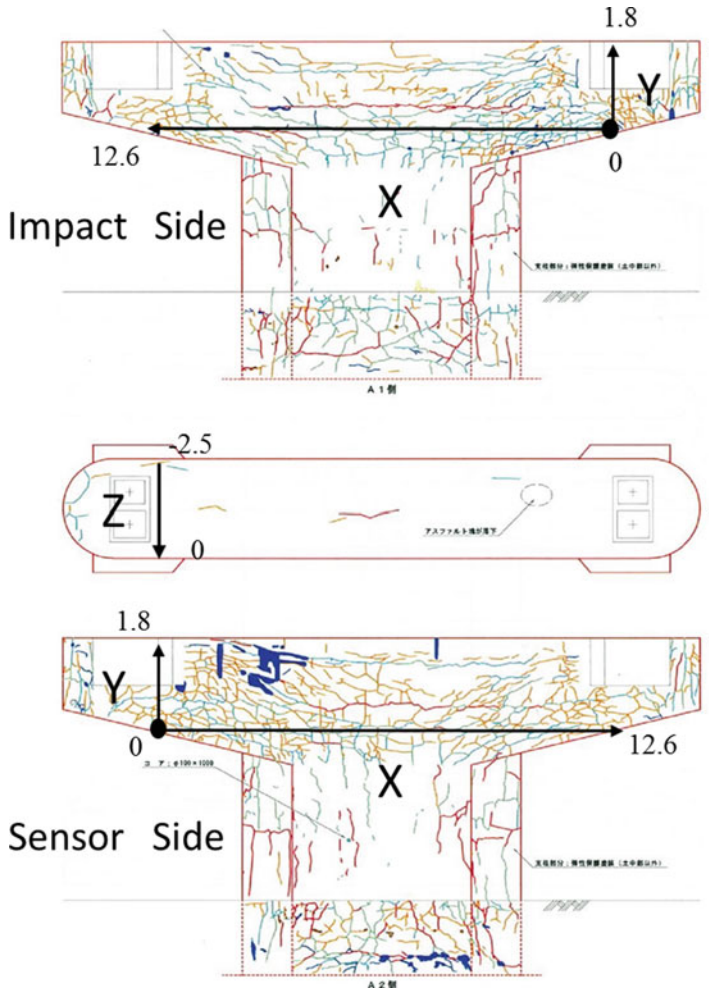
Surface damage of P2 and coordinate of bridge pier
